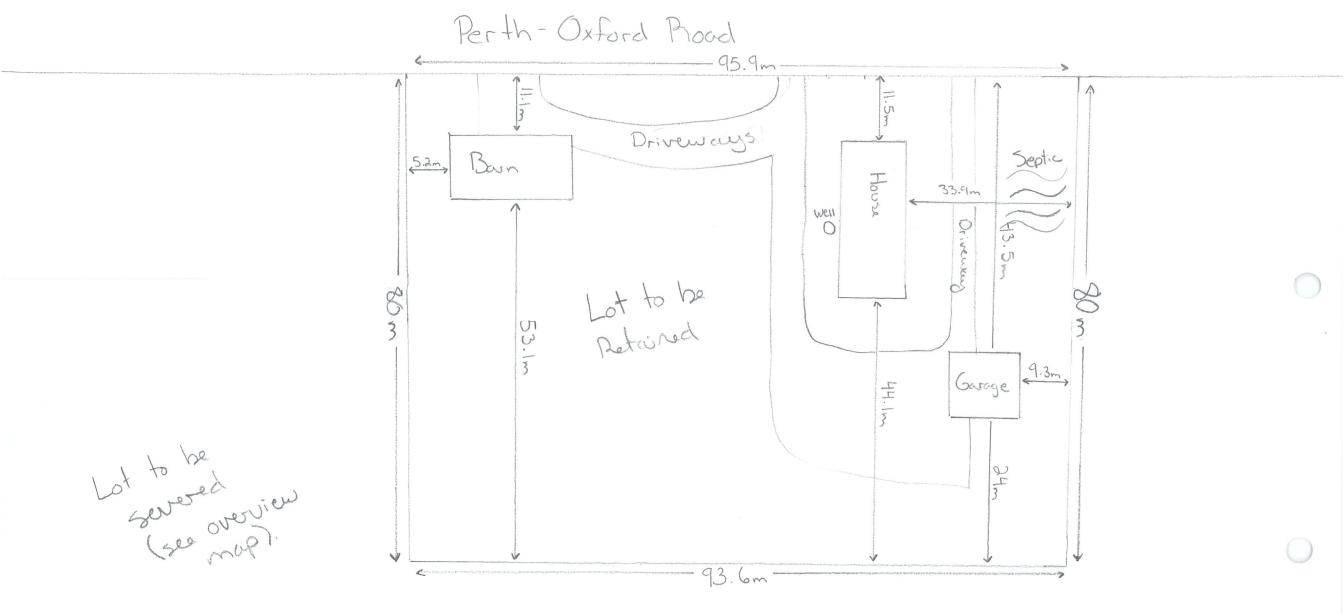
Applicants' Sketch - Proposed Lot to be Retained File No. B24-55-2 (The Estate of Sjoerd Heeg) Part Lots 35-36, Concession 19 (East Zorra), Township of East Zorra-Tavistock, 986044 Perth-Oxford Road
